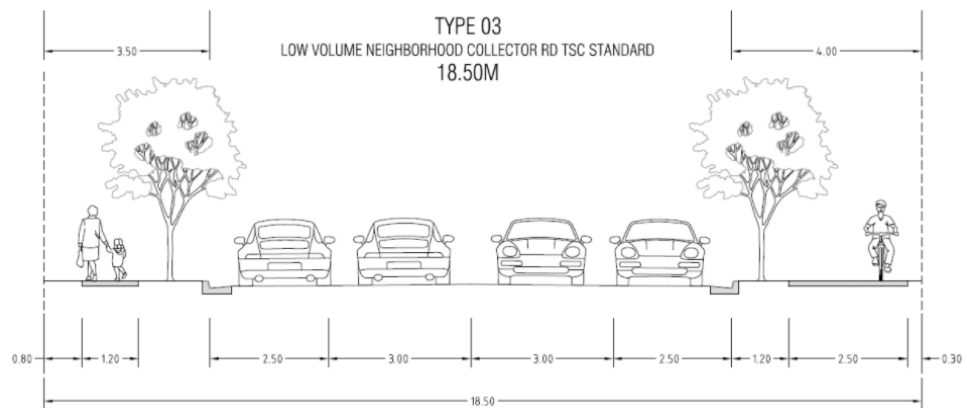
Proposed Low Volume Neighbourhood Collector Road (18.5m) Cross Section
